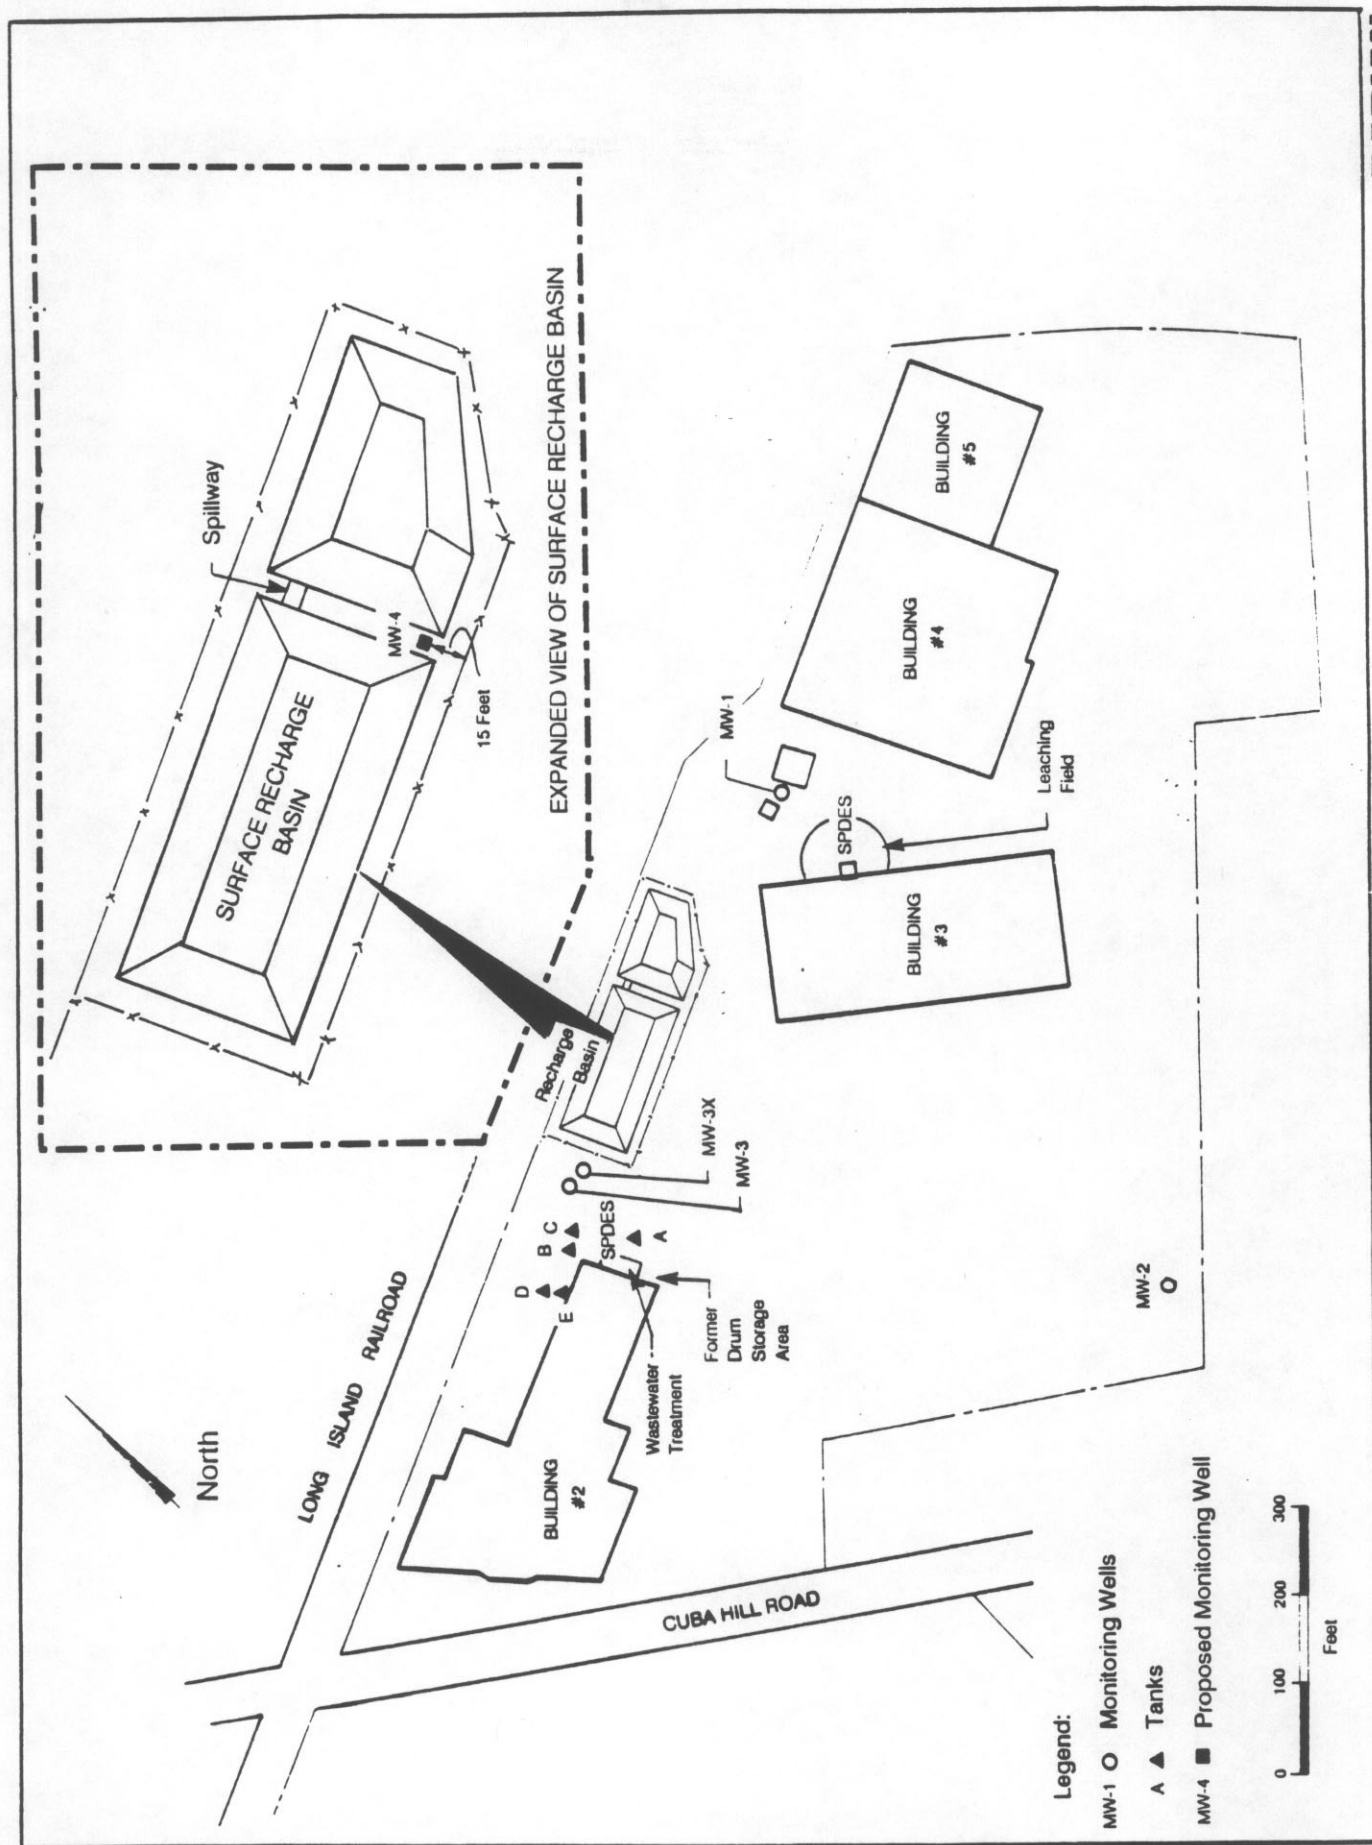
Site Plan, Hazeltine Corporation, Greenlawn, New York
